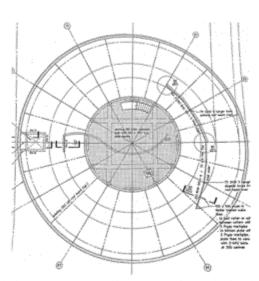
Plan of ring Blockwork walls at the edge with concrete MRF in the centre
